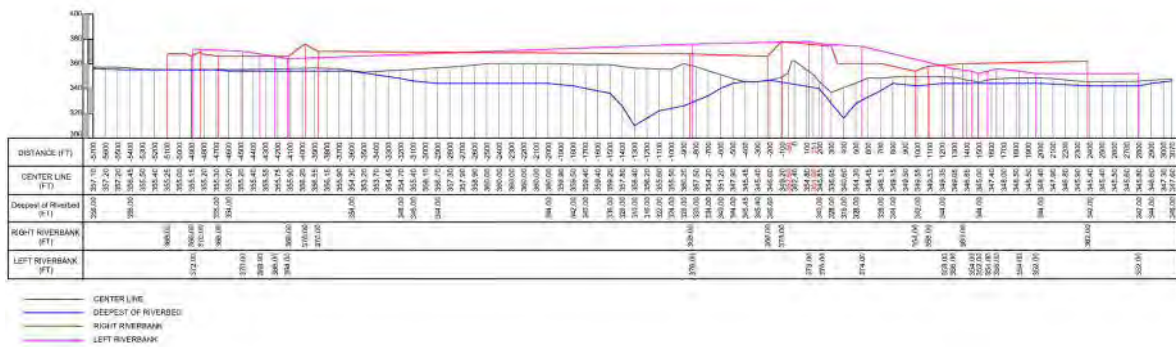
Drawing on the structure dimension of Kabo wire
